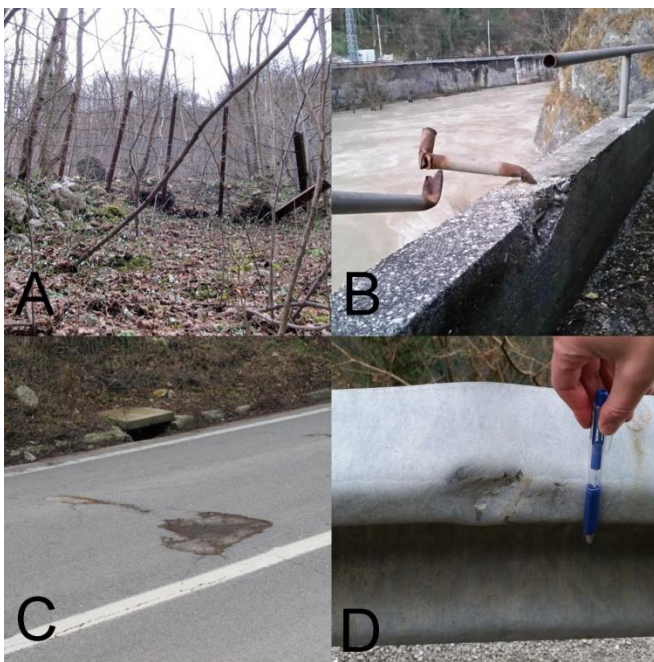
Selected observed damage. A: Fixed net barriers (note the large stopped blocks), B: Damaged concrete road fence along the river, C: Impact damage on the asphalt, D: Damaged road fence.
